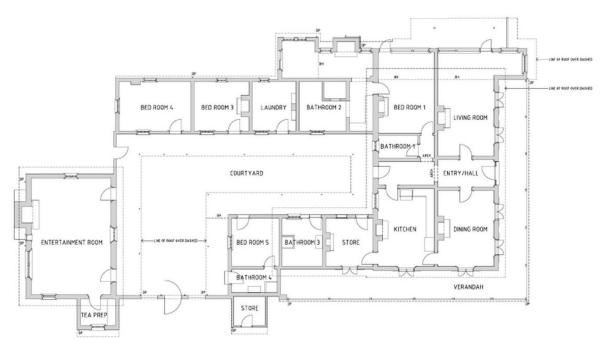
Main House. Existing Floor Plan (Source: GB&A 2012)
